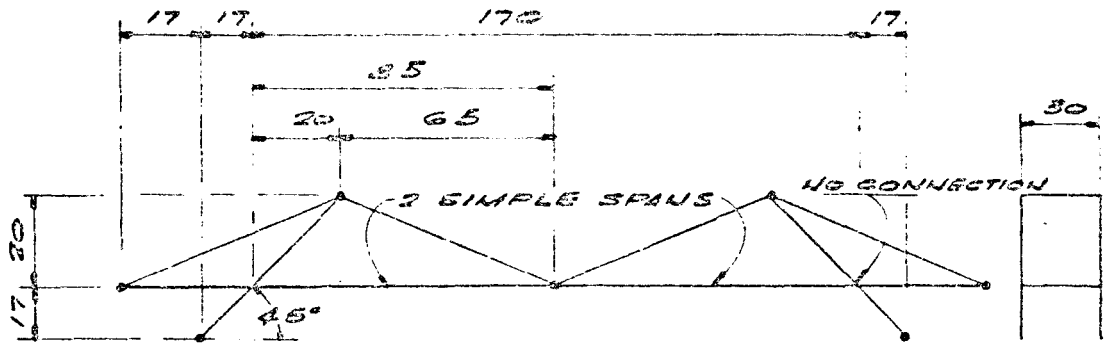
BRIDGE CONCEPT NO. 2 LEANING PIERS
